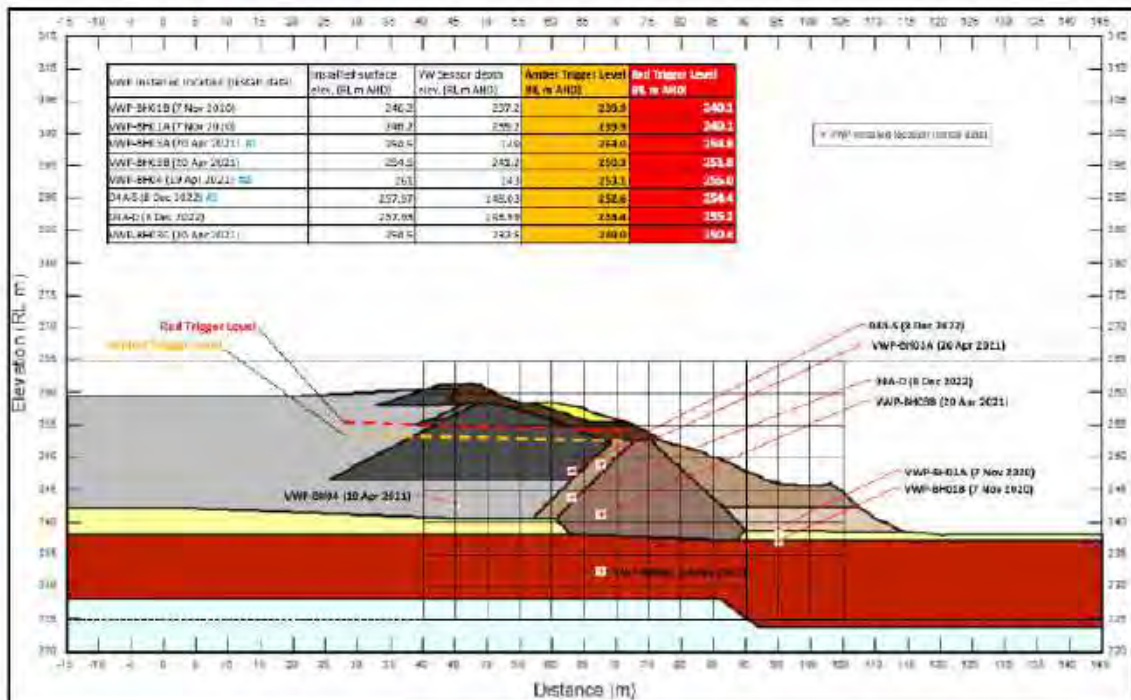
As-built FAD Cell 1 south wall embankment cross-section B - VWP trigger level profile
